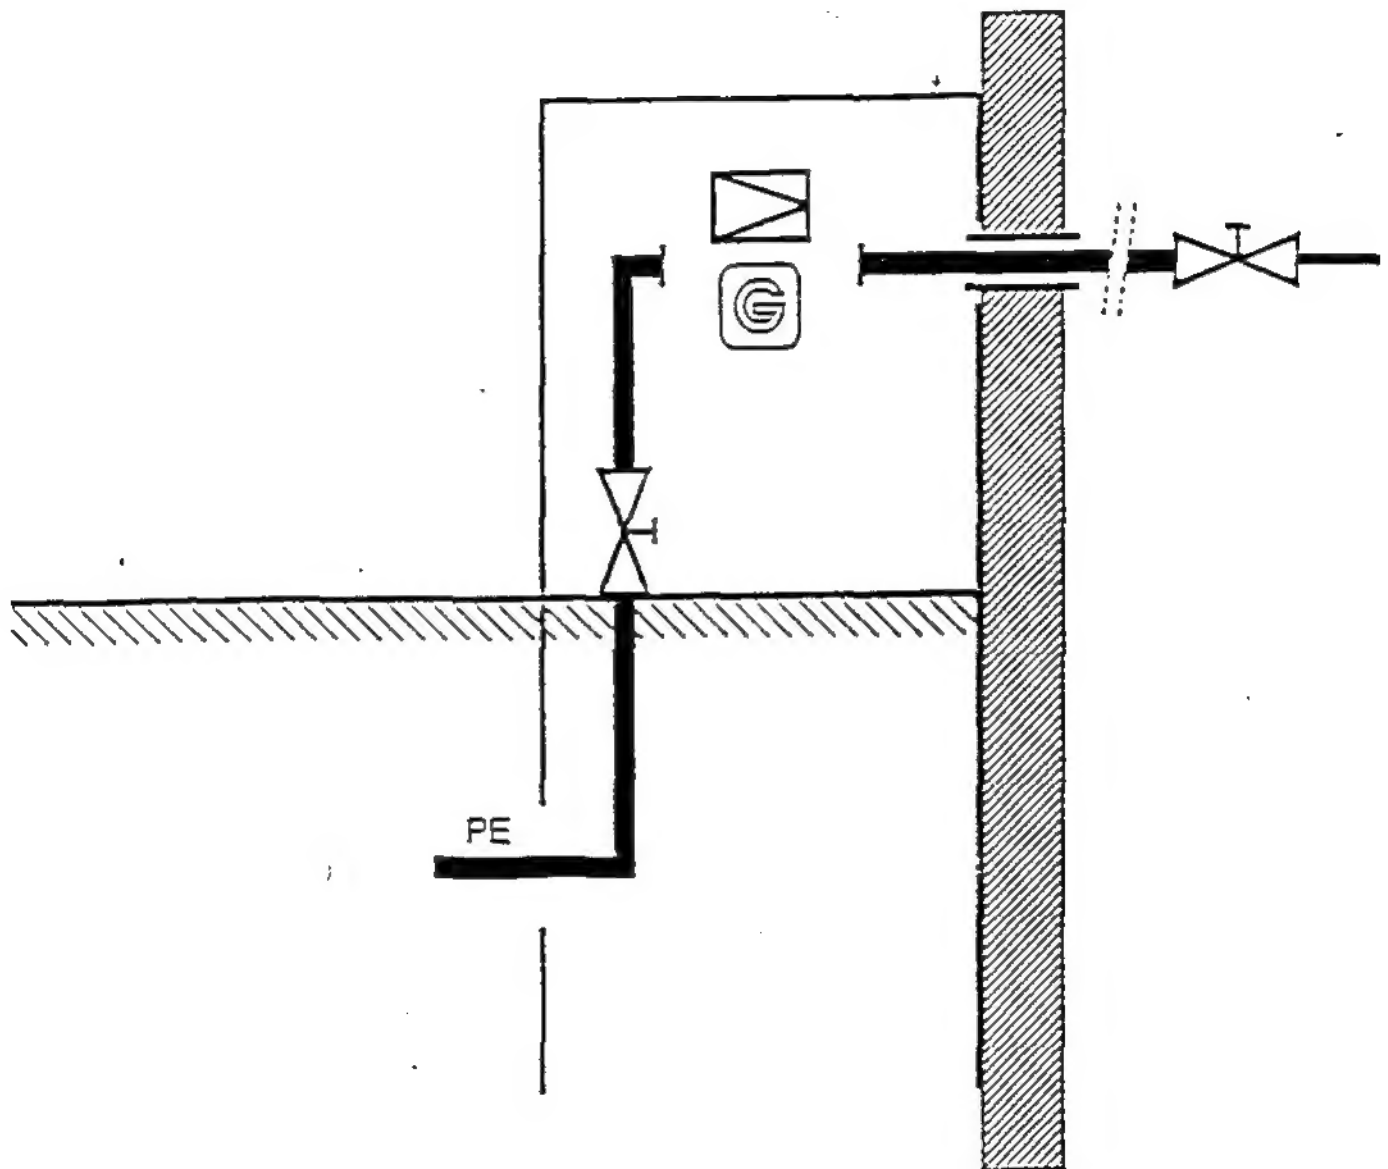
Insulating joint in control box and/or meter case at or in the exterior house wall; house-connection line made of steel or PE with transition to steel before the inlet into the box (case)- lead-in of the steel line into a building without cellar.
